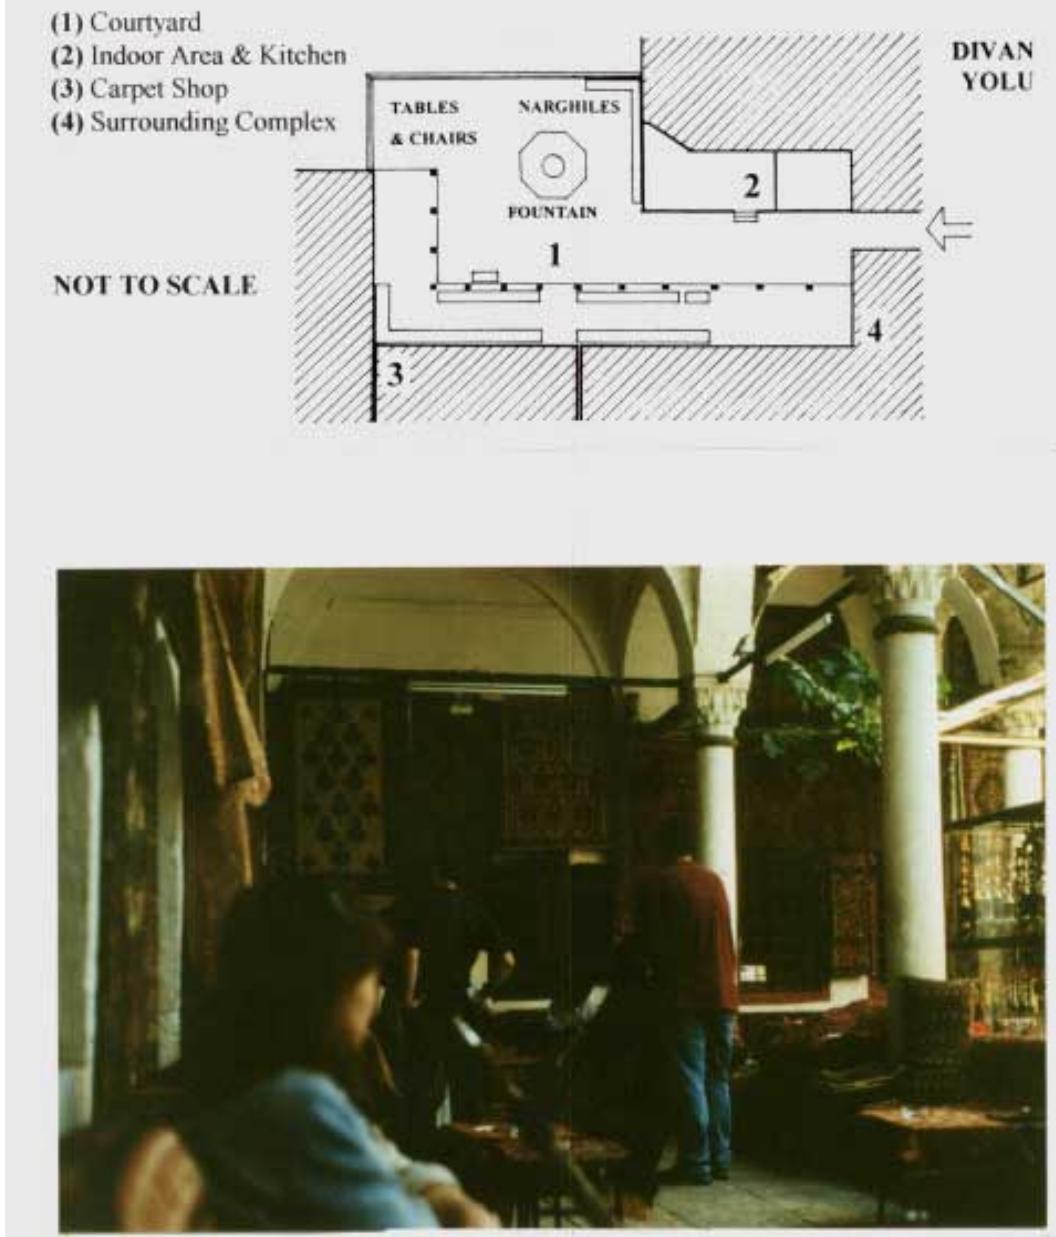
General view and floor plan of *Ali Pasa of Çorlu* coffeehouse.
